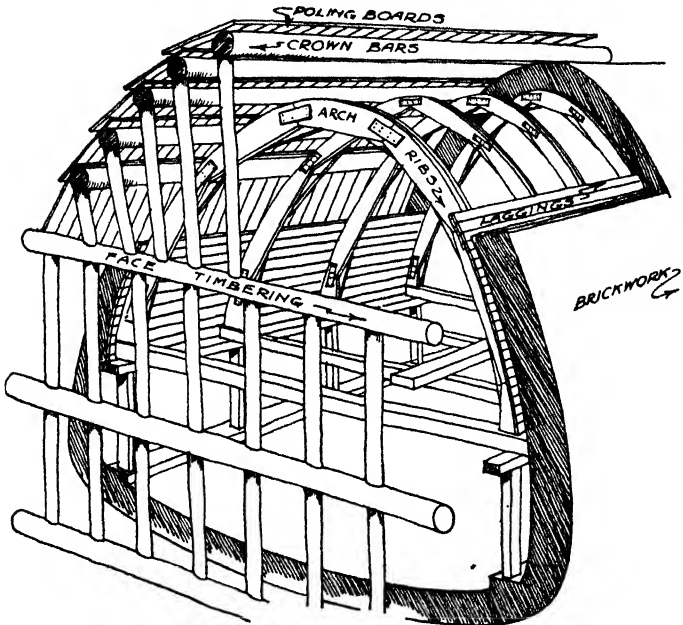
Dissected diagram of tunnel. Direction of driving towards the spectator. The poling boards of the face timbering are not shown.
